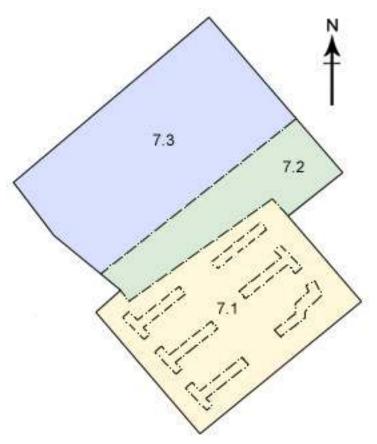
Plan of the groundworks monitored areas as discussed and illustrated in the sections below
